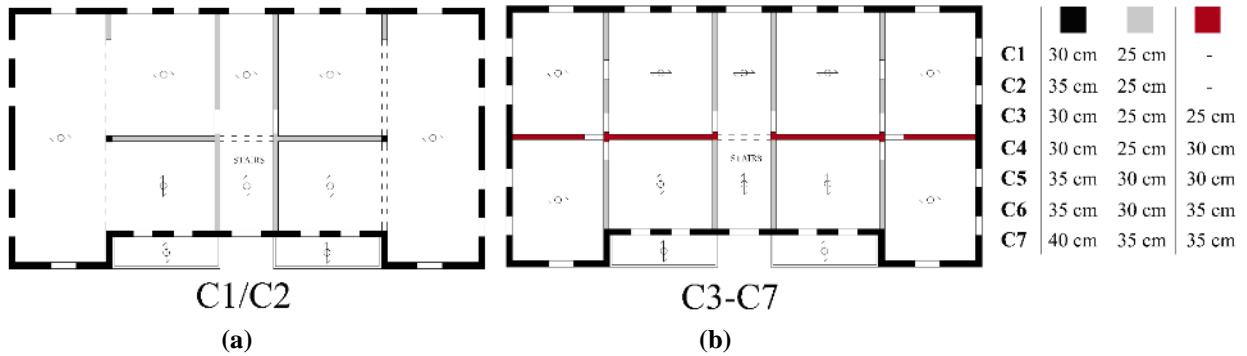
Structural configurations derived from the “C” type architectural configuration: (a) C1/C2 with internal r.c. beams and columns; (b) C3 to C7 with internal masonry walls.
